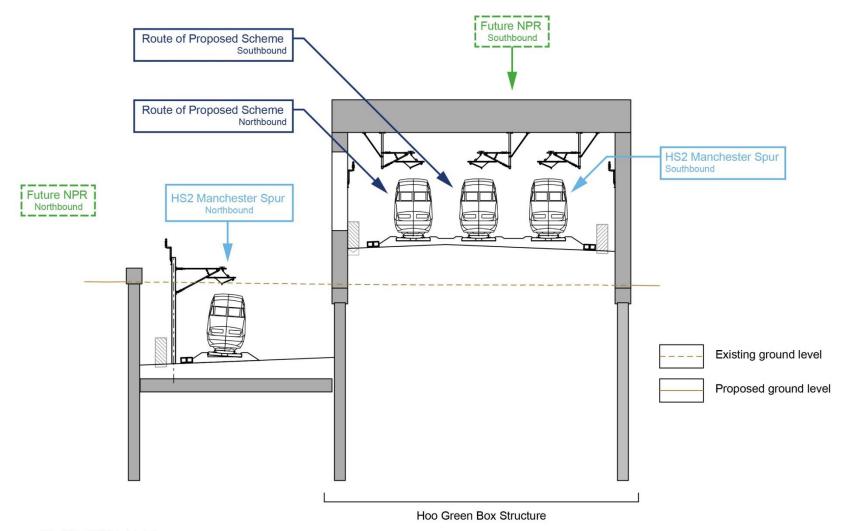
Hoo Green box structure and Hoo Green tunnel section A-A
